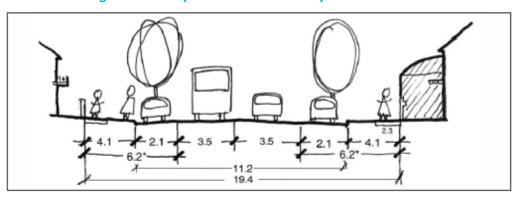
Proposed North Yunderup Road Cross-Section
